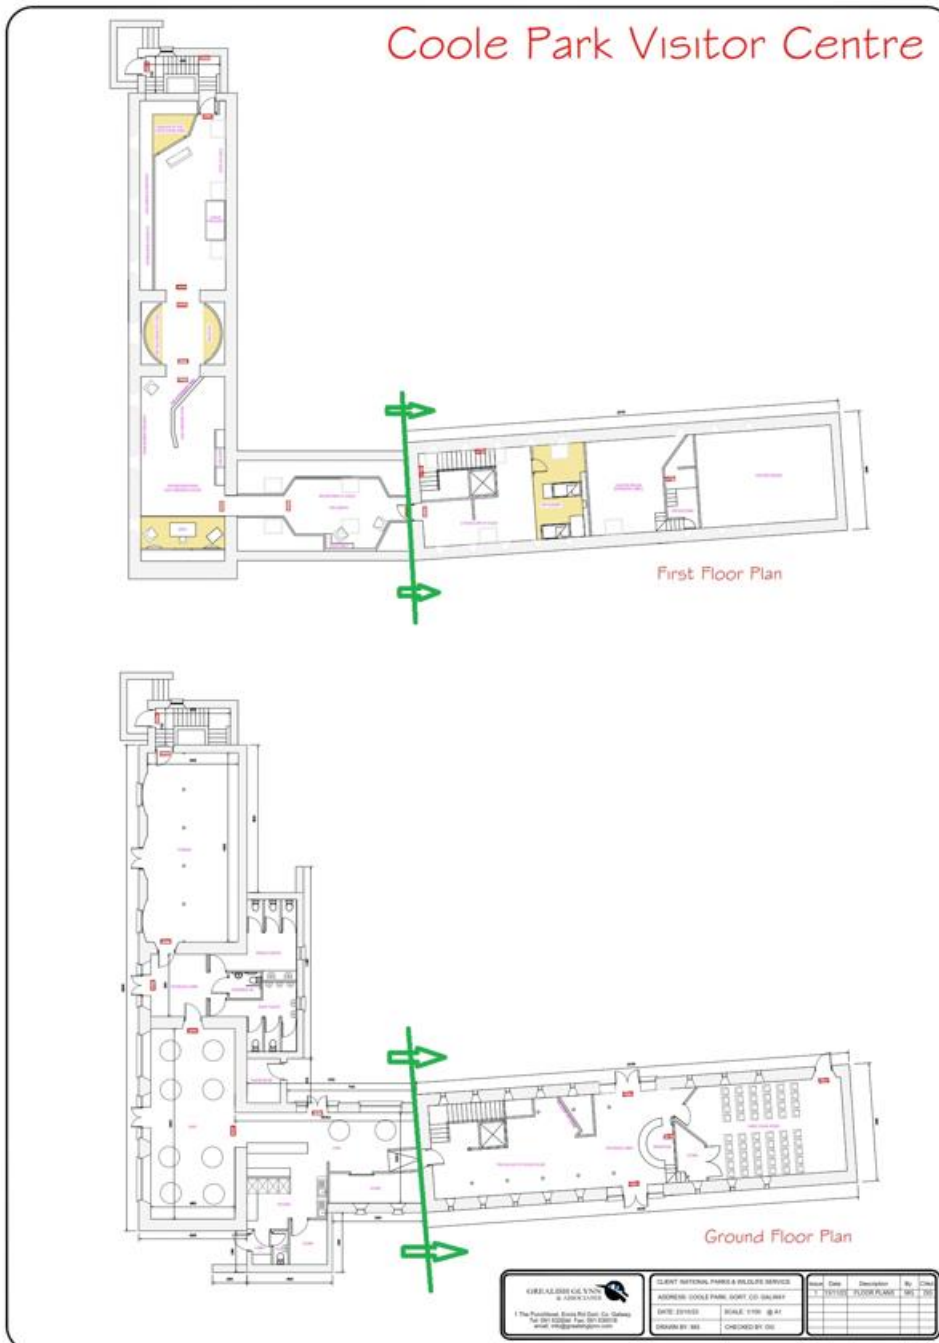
Ground floor and 1st floor plan of Coole Park Visitor Centre, Coole Park, Co. Galway.
